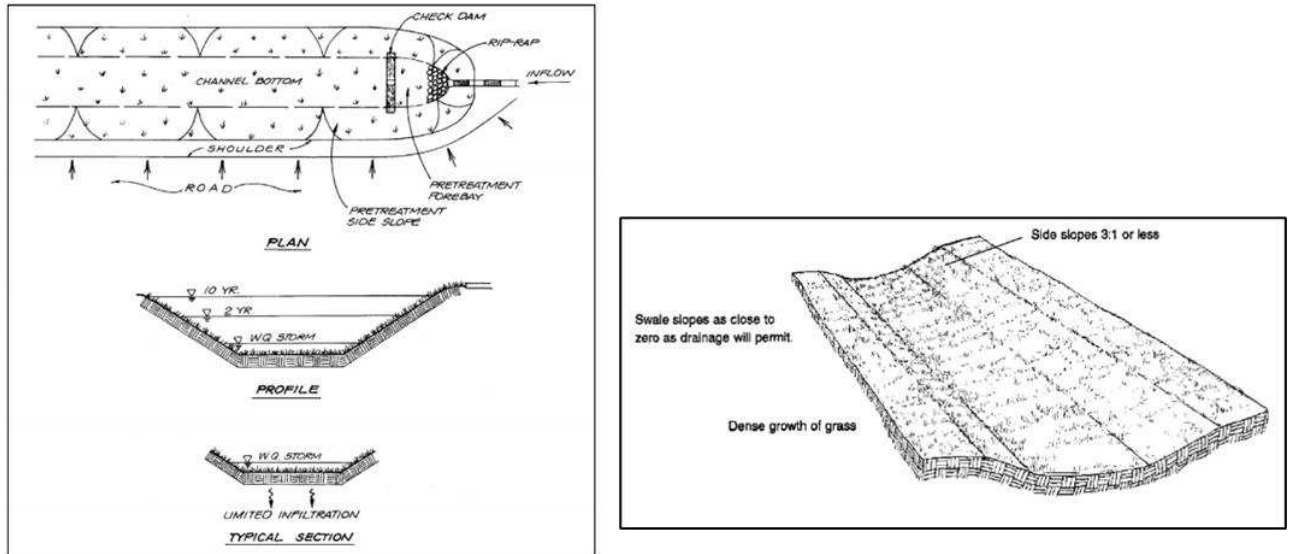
Plan, Profile, and Section Views of Grass Swale (ref: TRCA, 2010)
